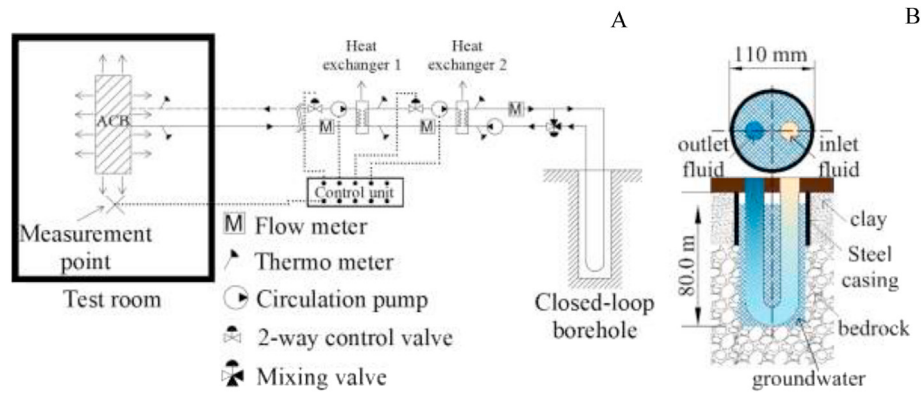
A) Pipework and control components in the ground and room loops, and B) borehole cross-section.
